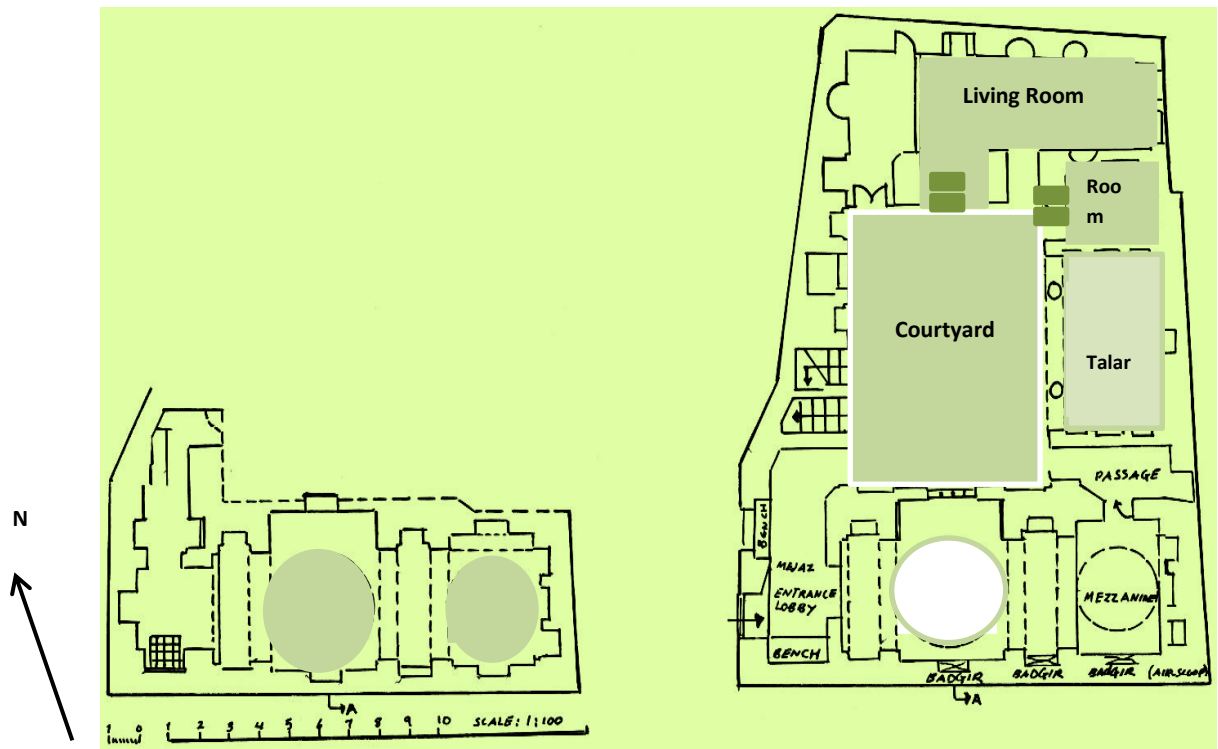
Basement level & ground floor level plans of traditional courtyard house No. 2. Scale: 1:50 (Researcher)
